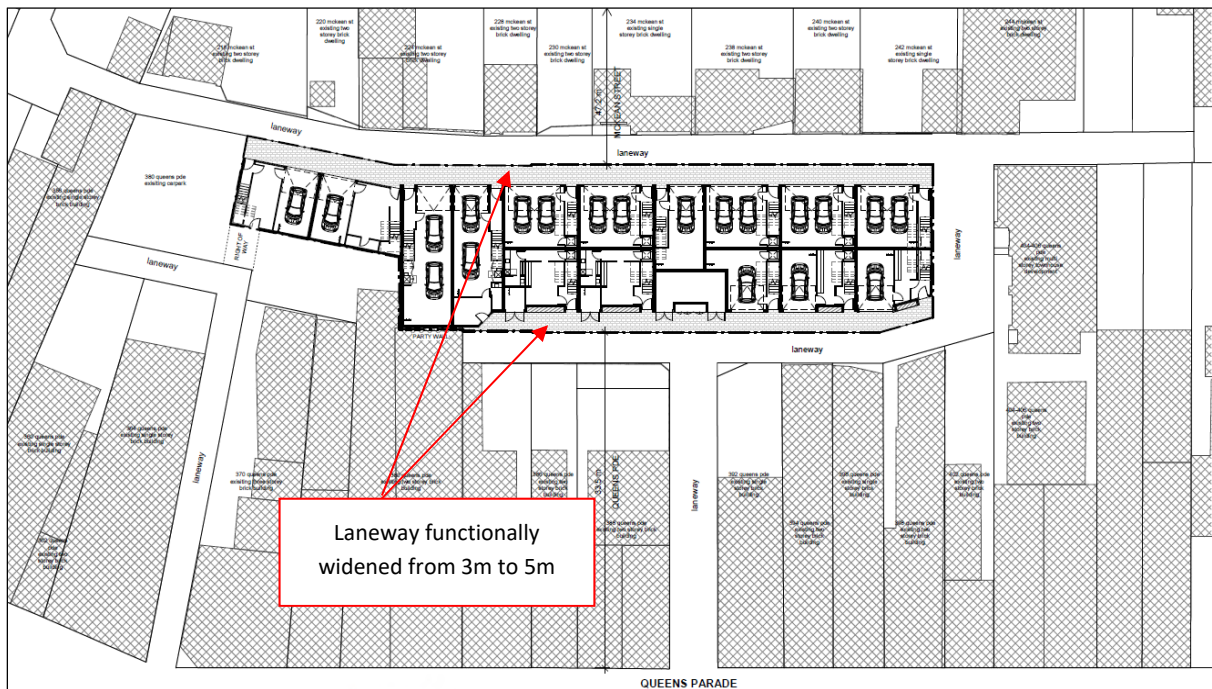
Potential improvements to Queens Parade-Howe Street Laneway
